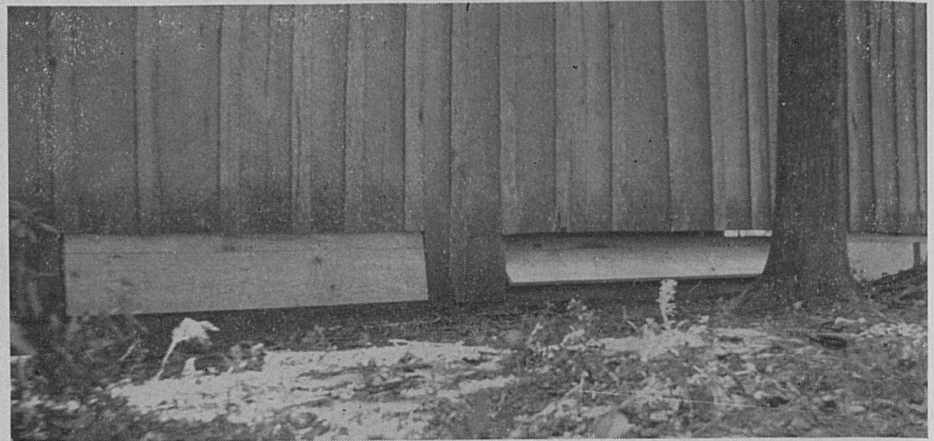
Bottom ventilators built on a dark fire-curing barn (according to figure 16) over a solid concrete foundation.
